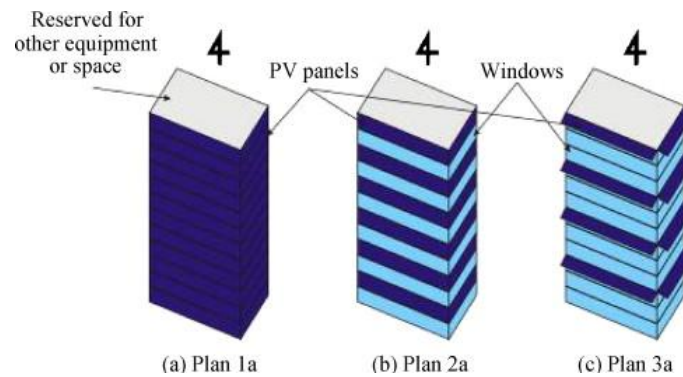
Schematic diagrams of the attachment plans for high-rise building.
